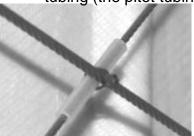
securing crossing cables, and check for incorrect fixing of lower central frame.
